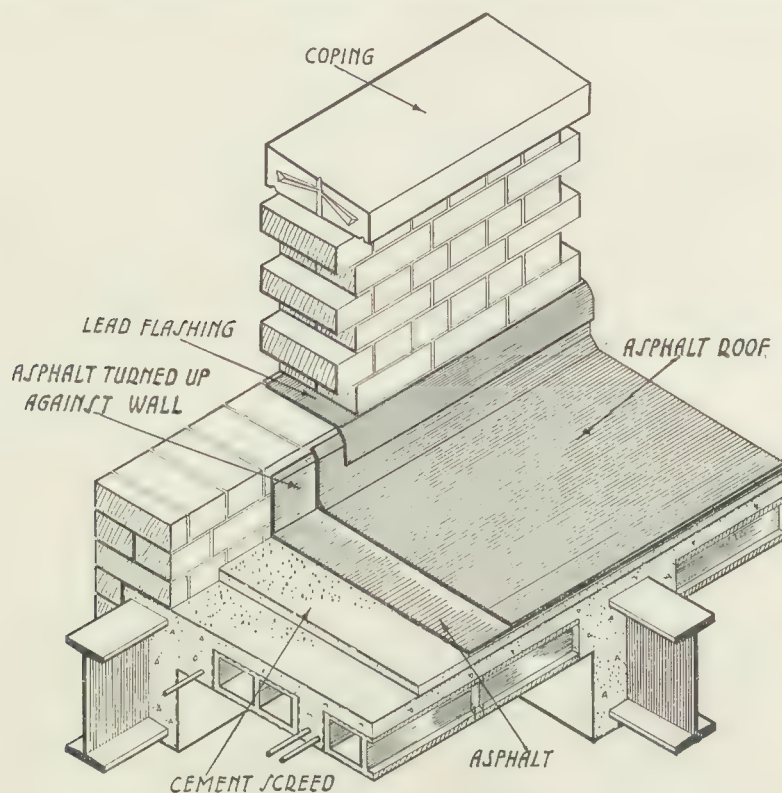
CONSTRUCTION OF FLASHINGS TO FLAT ROOF
